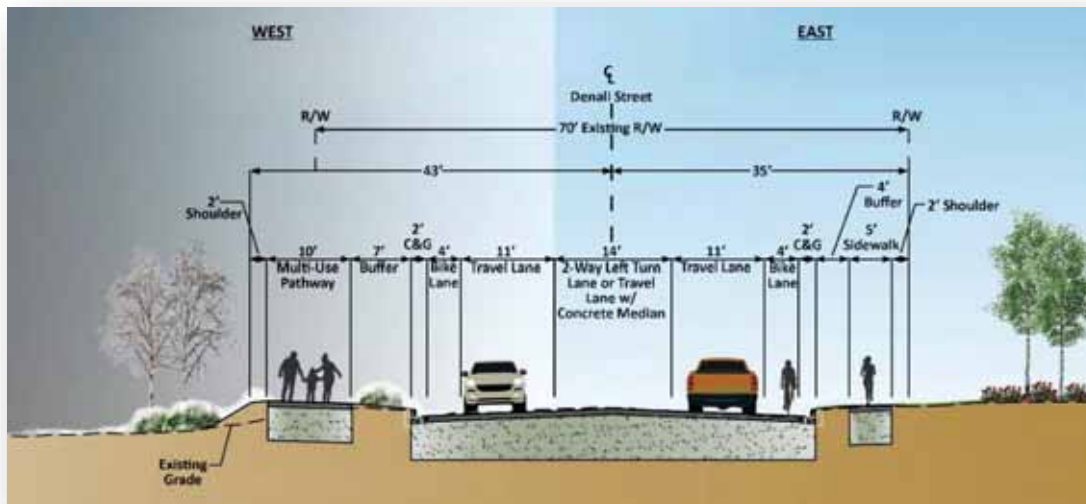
Denali Street (Tudor Road to 36th Avenue) – Alternative 3
